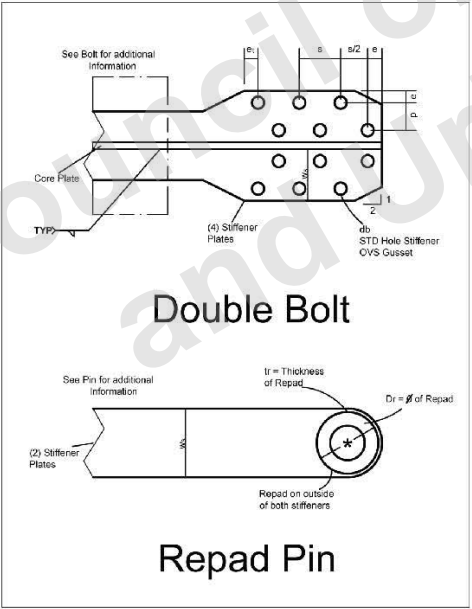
Double Bolt and Pin Connection Details for BRB-1
